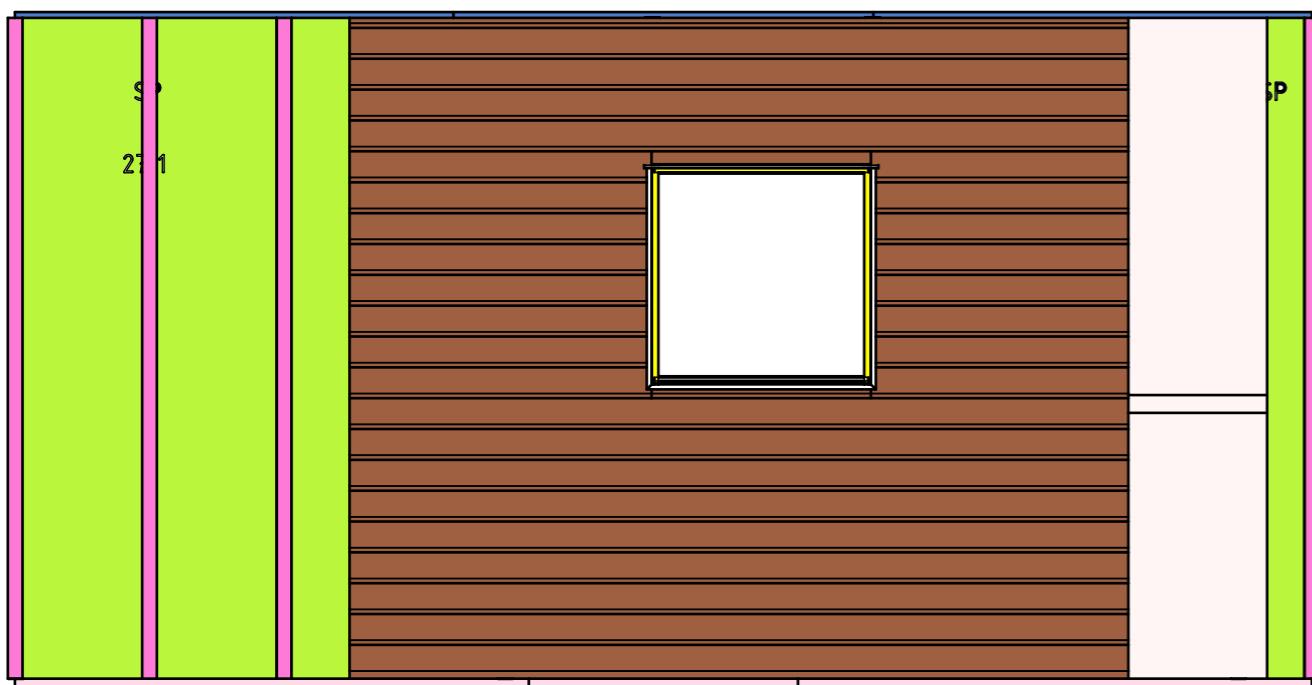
Nail depth with Cladding to Panelok Standard Panel
